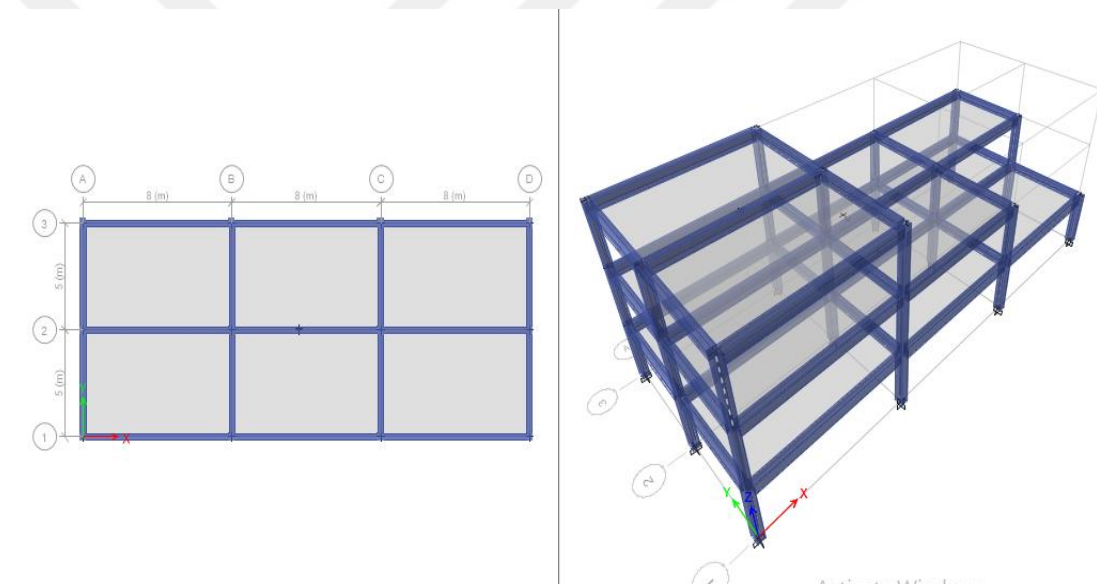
First story plan and 3D of 3 story irregular rcc building
